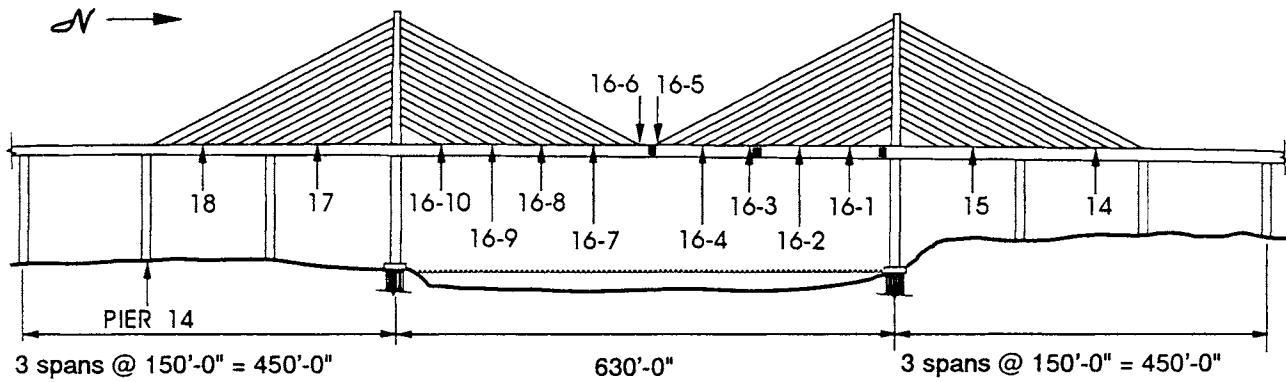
Elevation View of the I-295 Bridge Showing Longitudinal Locations of the Test Vehicle.
